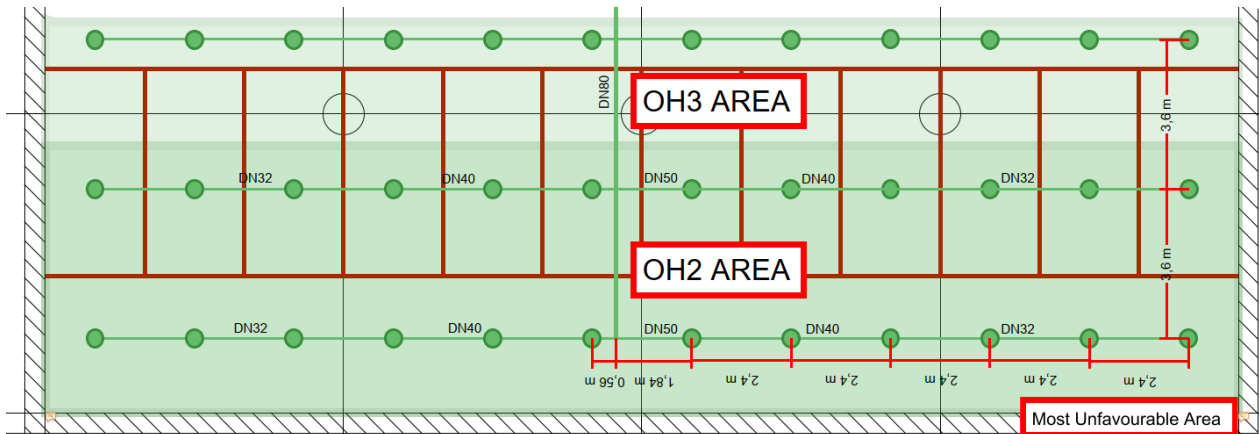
Scenario 3: Underground parking garage partial drawing of the system design of the unfavourable area for NEN (Detailed drawing can be found in Appendix A3.3)
